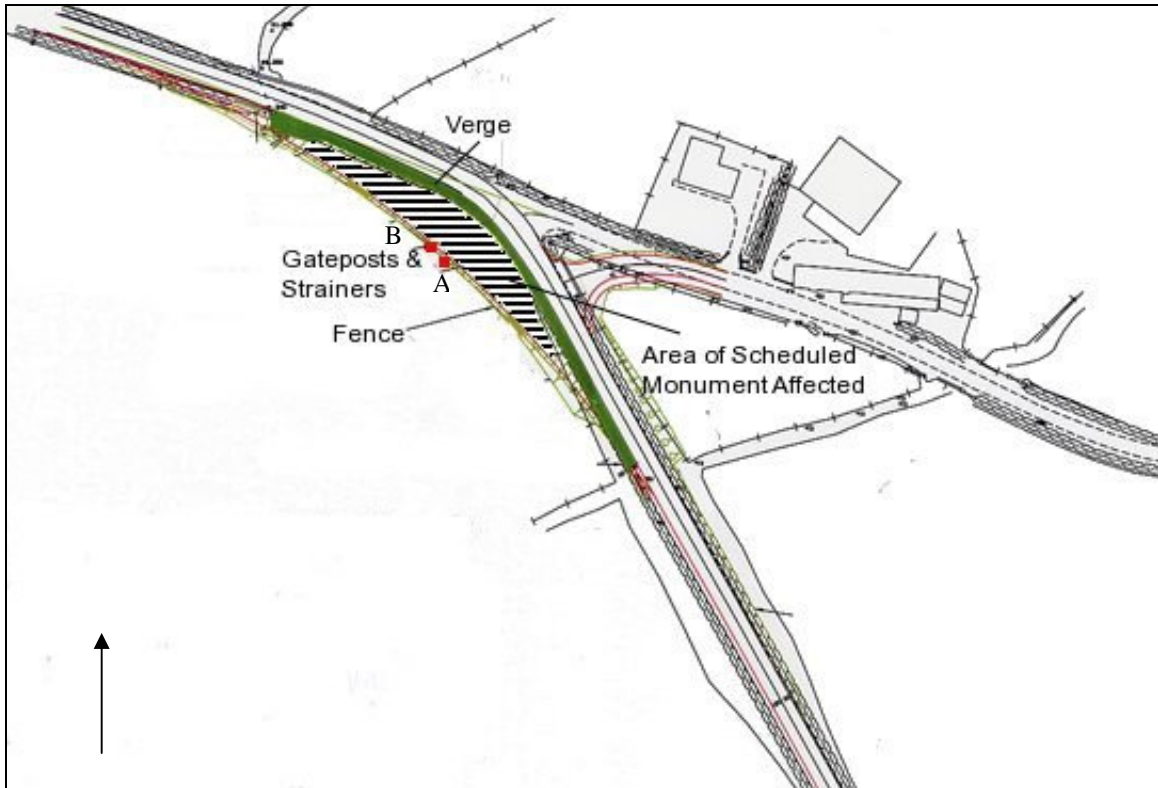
Plan of road safety Improvement works showing location of trenches for the gateposts and strainers.
